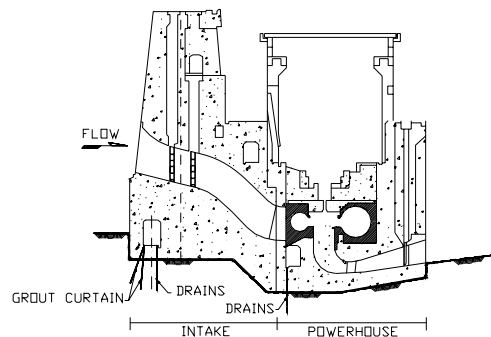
Typical cross section of block 2 of the intake and powerhouse structures of Isamu Ikeda dam
